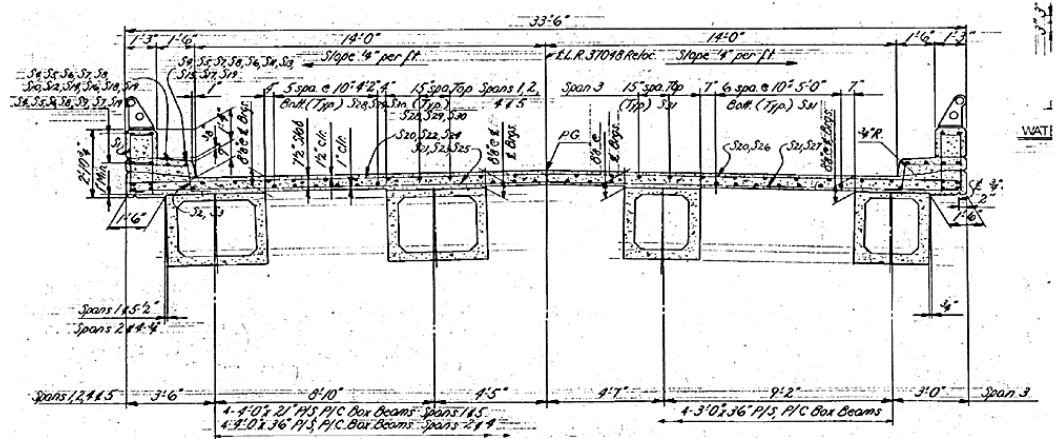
As-Built Plan (Typical Cross Section View) Bridge No. 22387
